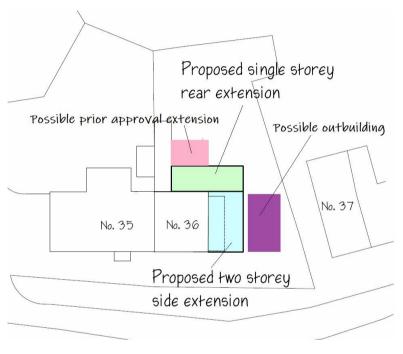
Indicative area of extensions possible under prior approval notification and erection of outbuildings.
